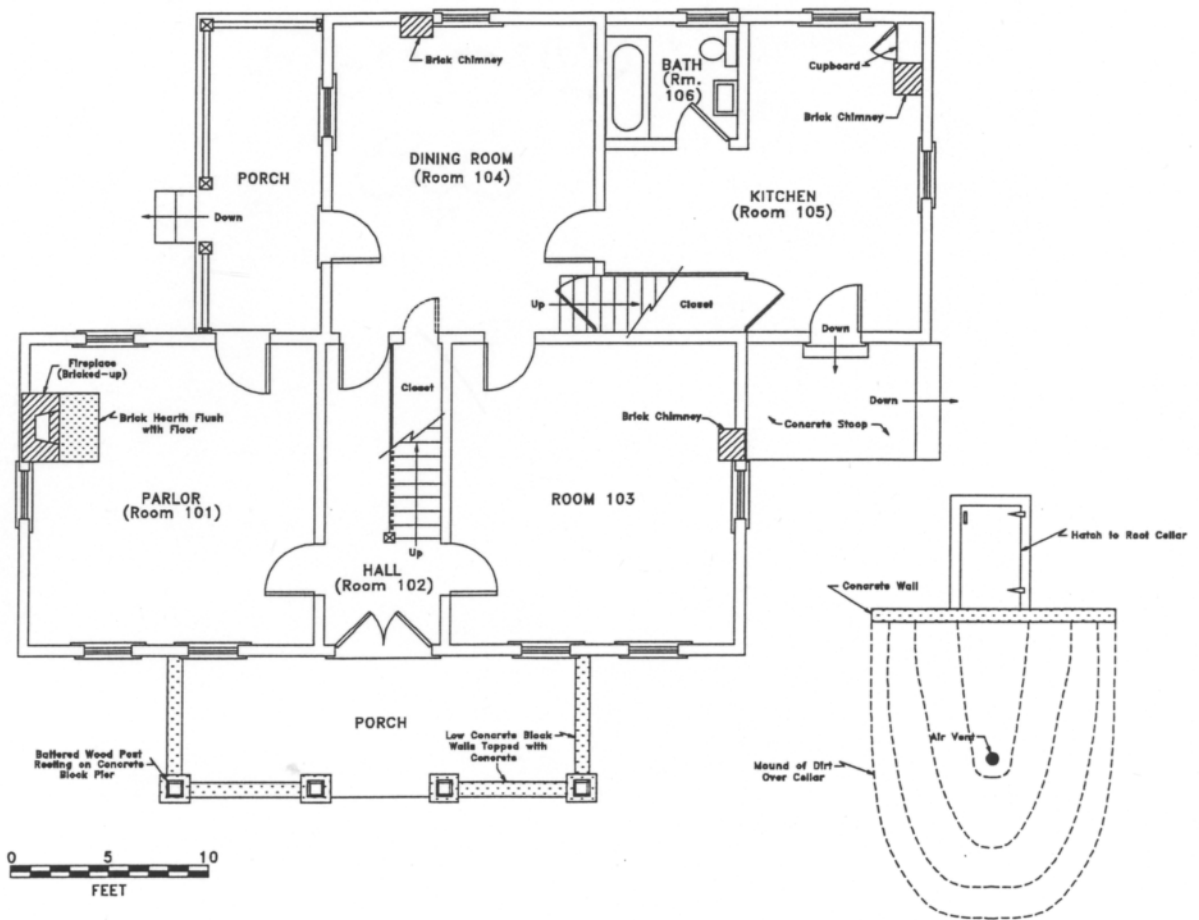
Ground floor plan of the Williamson House, showing recent modifications, 1995.
